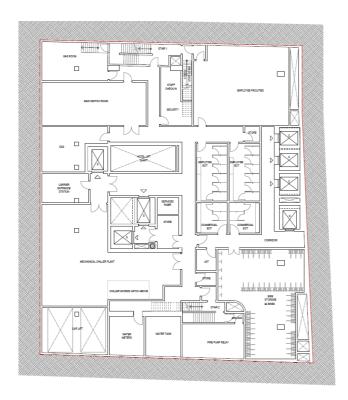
| Proposed basement level 2 (Source: Woods Bagot)
